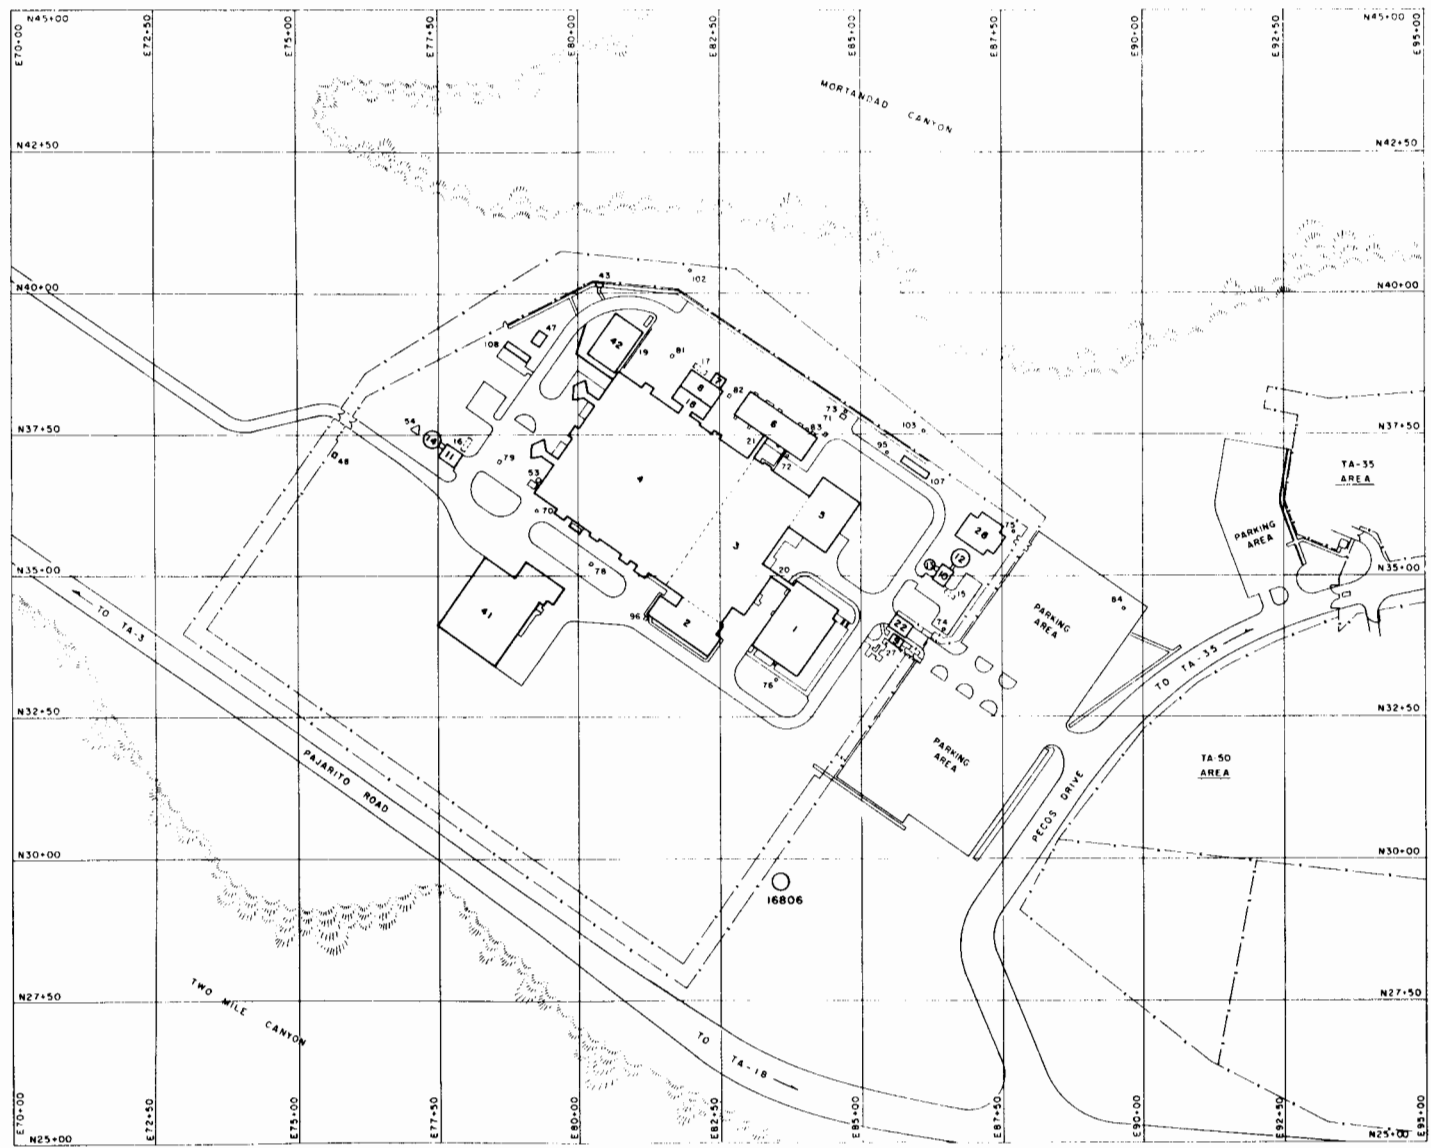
Structure Location Plan for TA-55 - Plutonium Processing Facility
